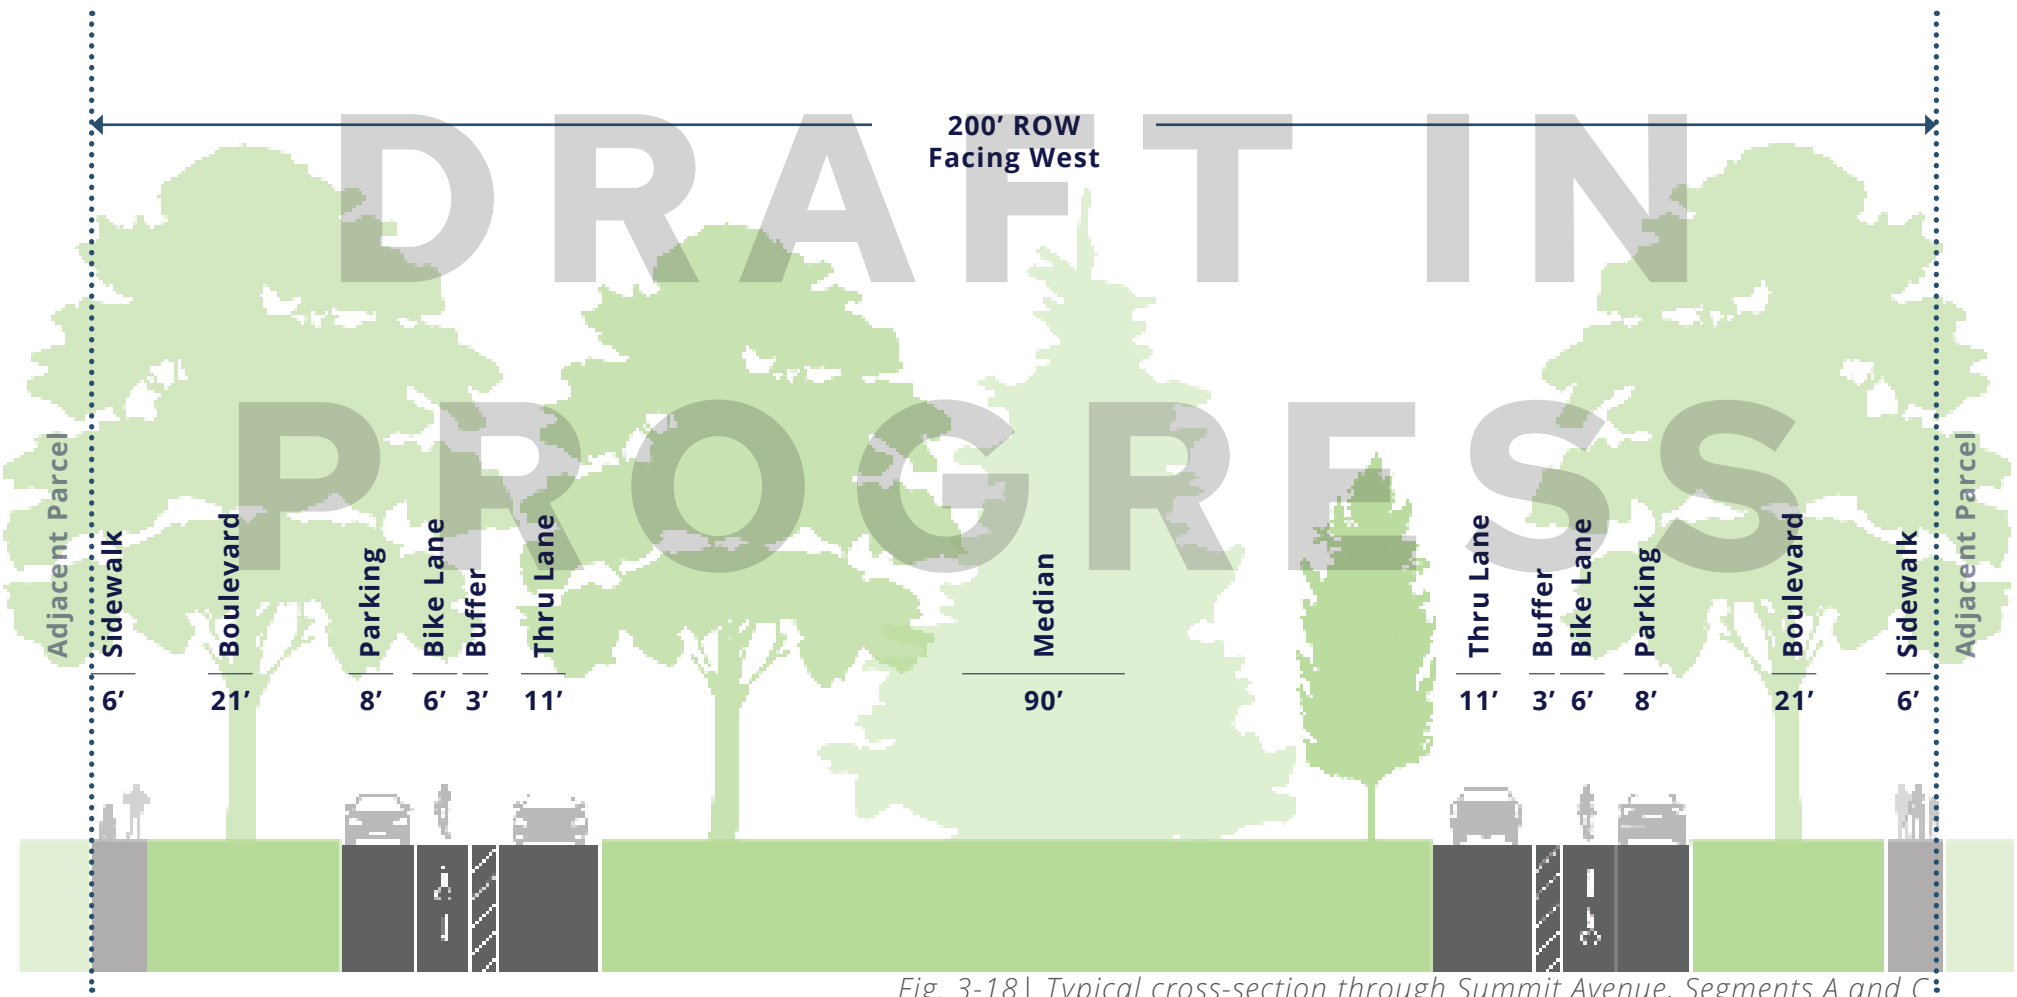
| Typical cross-section through Summit Avenue, Segments A and C
